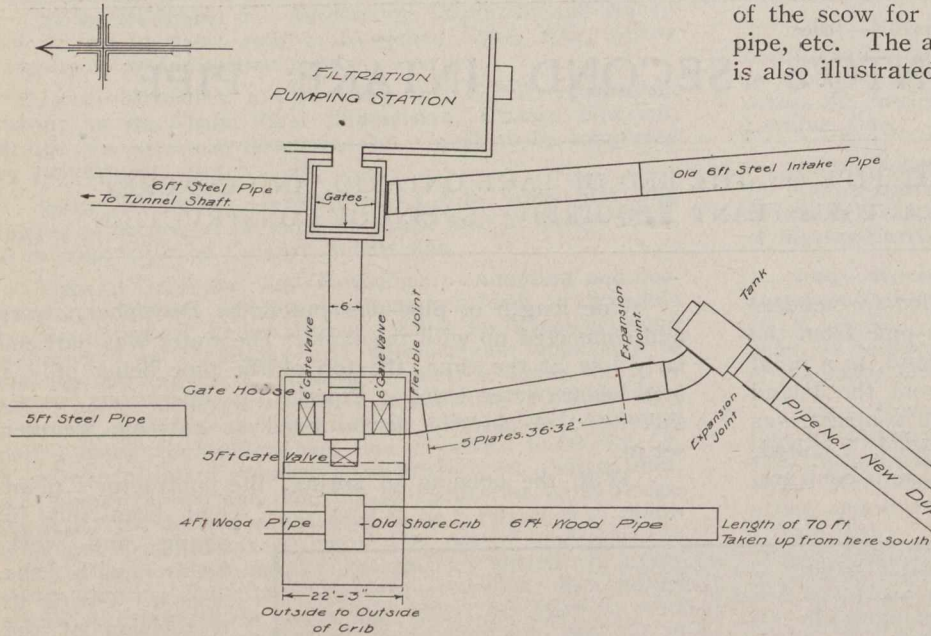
General Plan of Island Shore Connections, Showing Location of Old and New Intake Pipe.
